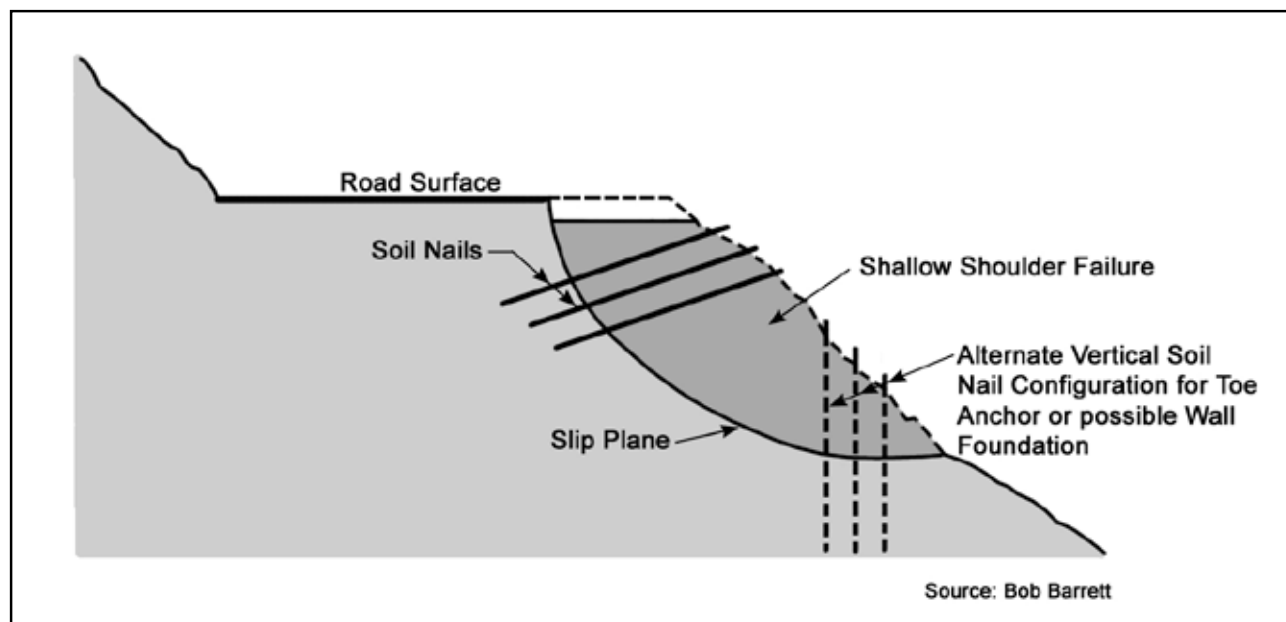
A roadway shoulder failure stabilized with launched soil nails. (Courtesy of Bob Barrett.)
